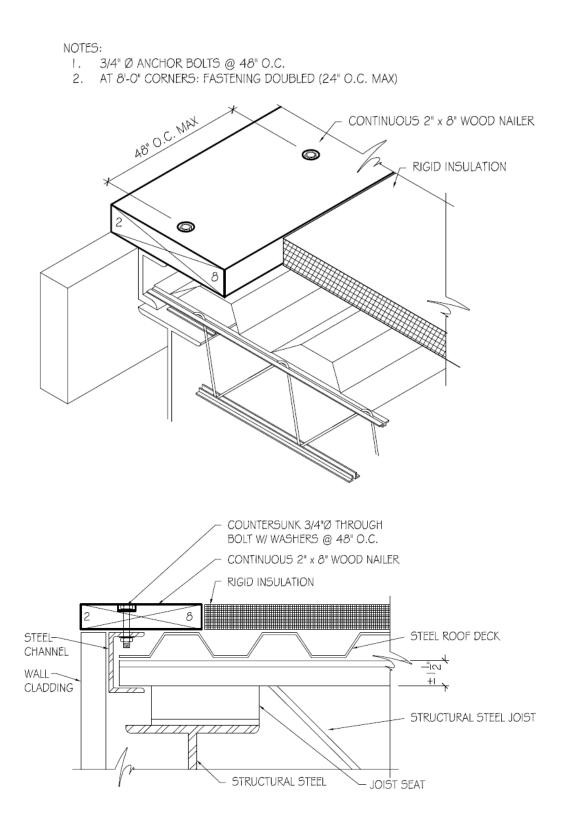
ROOF EDGE WOOD BLOCKING - THROUGH BOLT ANCHORS
